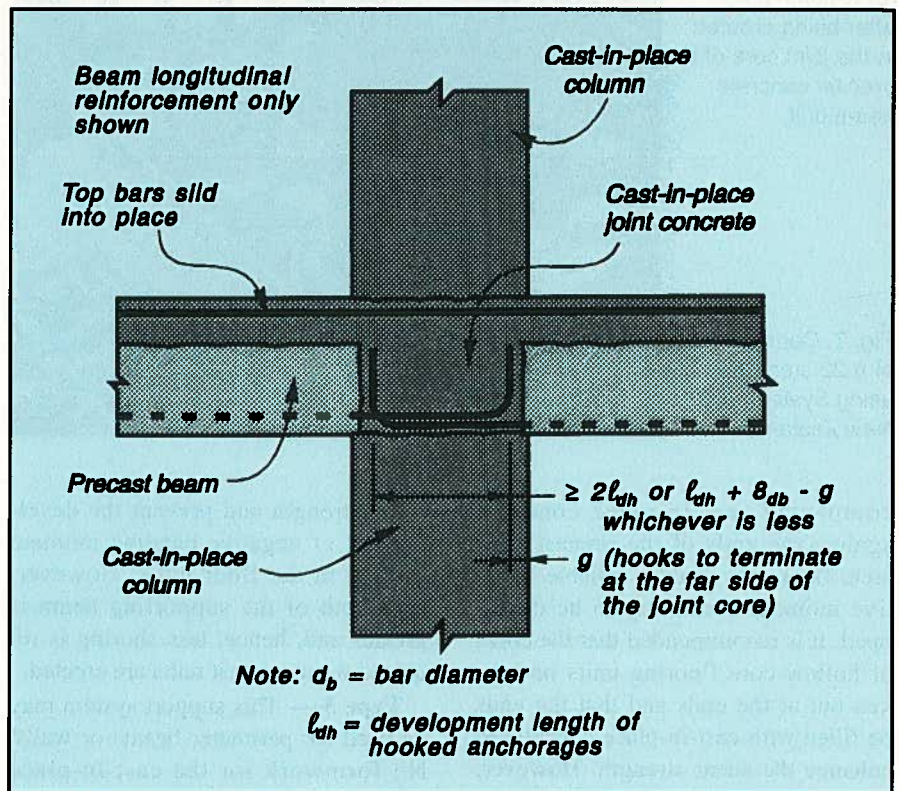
Hooked lap of bottom bars within joint core for System 1.
